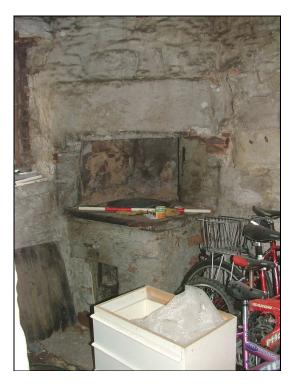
Stone-built surround for a set-pot, interior of the wash-house (Scale = 1m)
